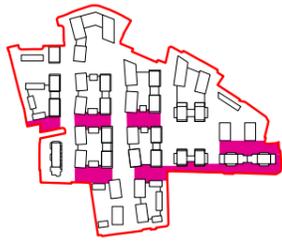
Street coding plan: between Plot A and the Parish Rooms.
